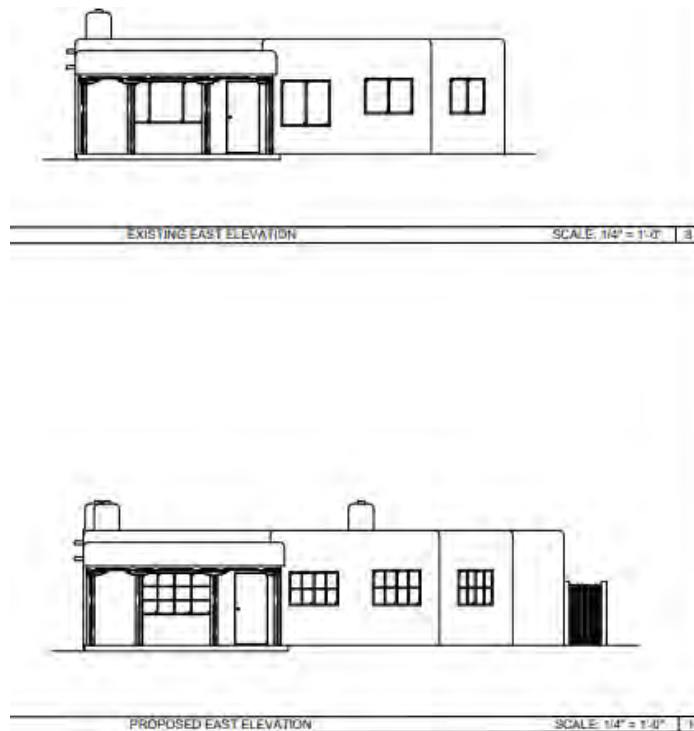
Existing and Proposed East Elevation and Primary Facade of the main residential structure.
